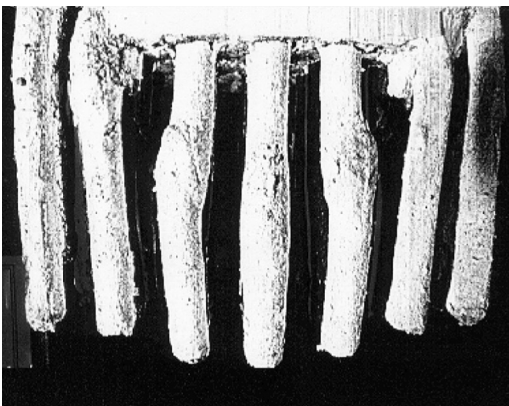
Deformed group of short thick columns, test TS08 (Hu '95).
